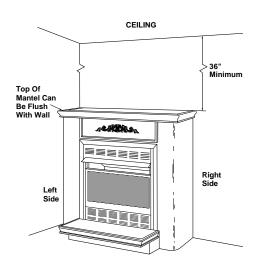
Mounting Clearances As Viewed From Front of Fireplace Shown with Optional Mantel
